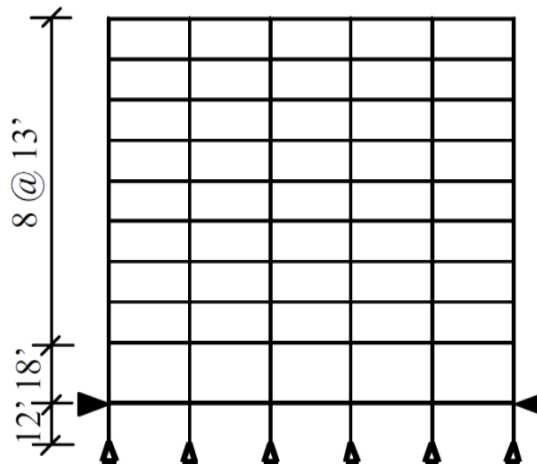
Elevation view of LA building (Source: FEMA 355c, Appendix B)
